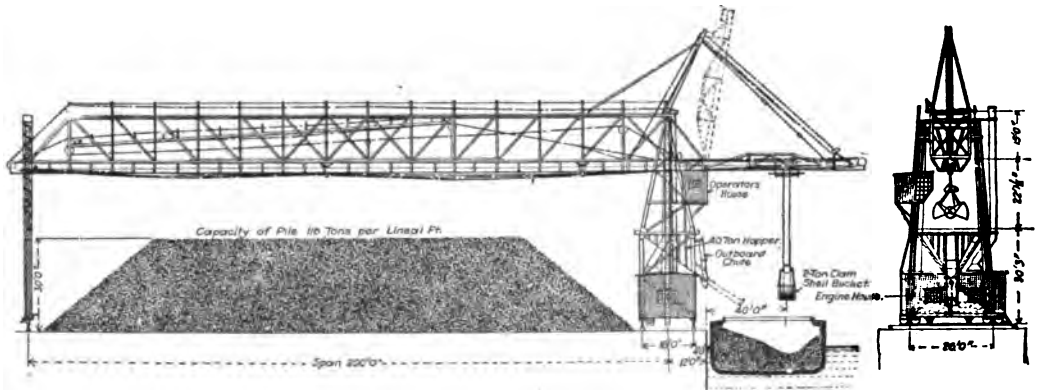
Dodge Traversing Gantry Bridge, Coal Storage Plant at Shady Side, New York (*Engineering Record*).
